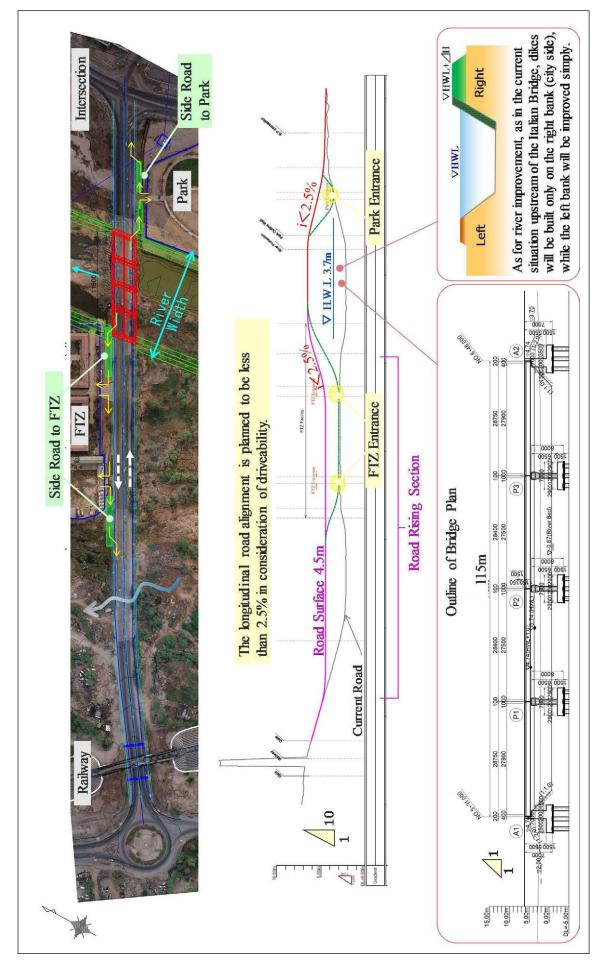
Outline Drawing of the Countermeasures (Additional Alternative 2)
